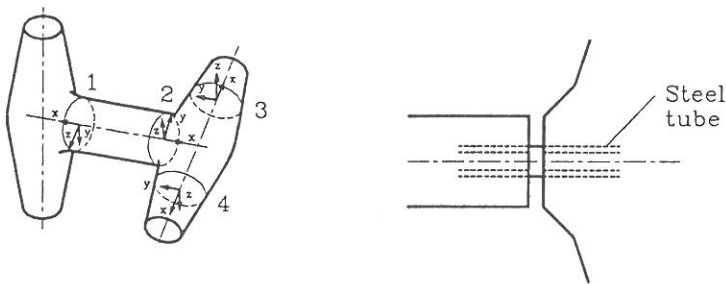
Instrumented sections. 200 kg concrete Dolosse, Aalborg Hydraulic Laboratory (AHL).
